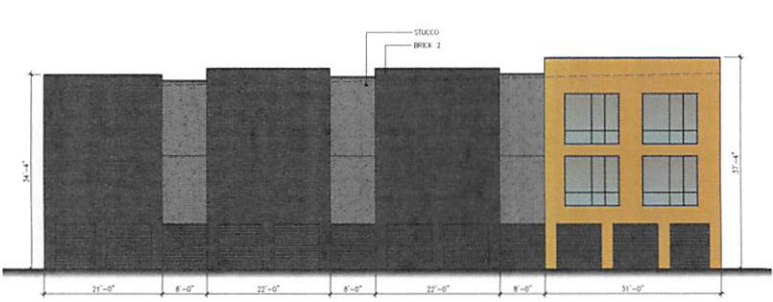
EXHIBIT D - ARCHITECTURAL ELEVATIONS
